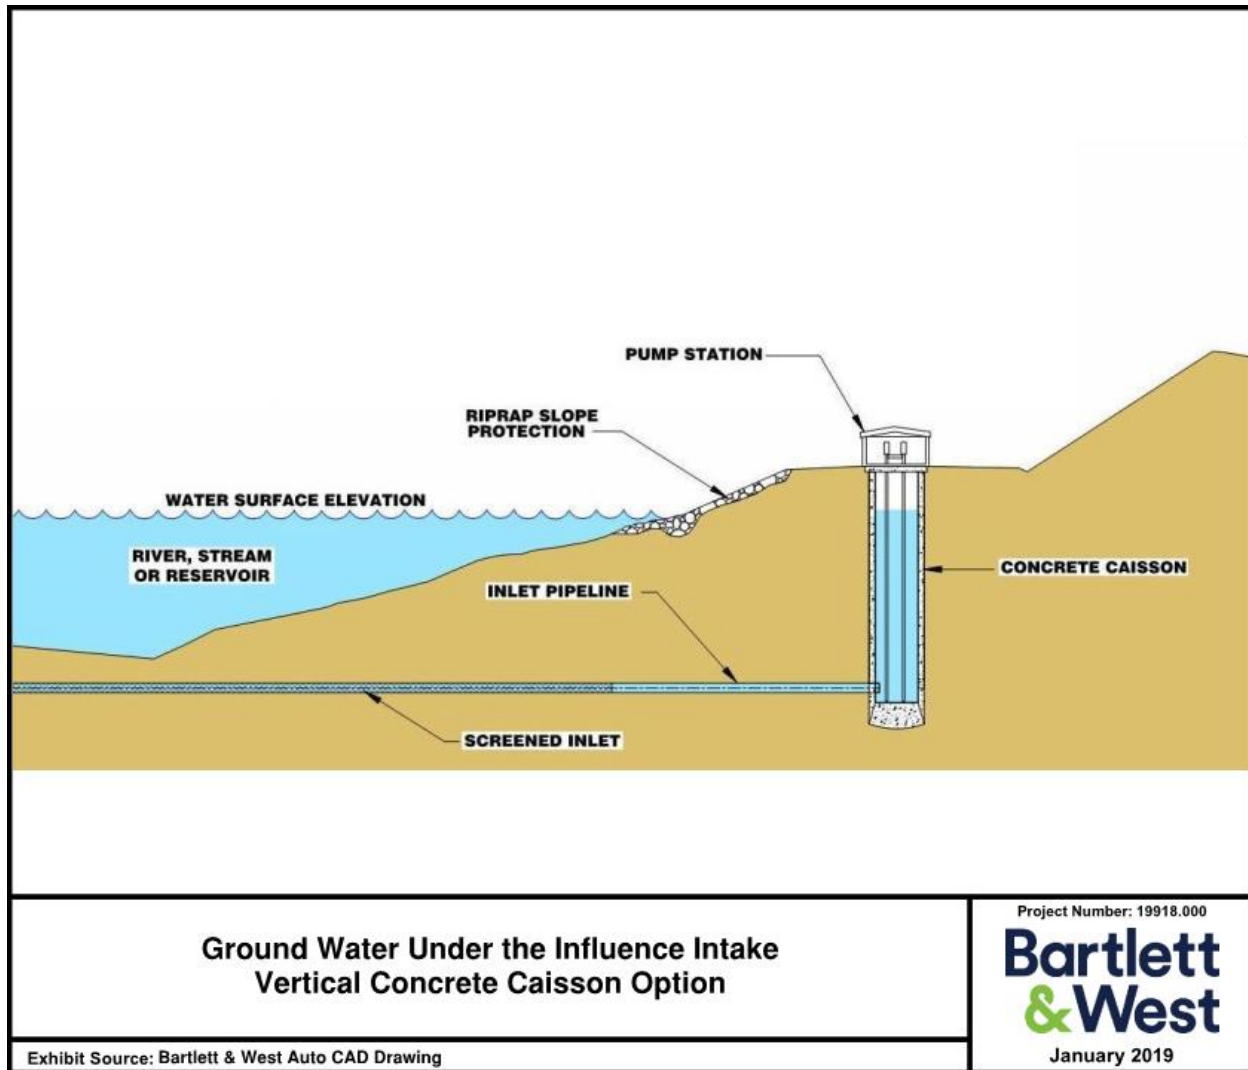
Ground Water Under the Influence Vertical Concrete Caisson Layout
